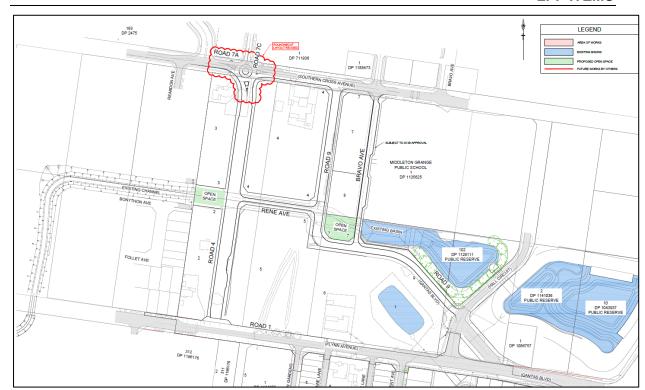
Proposed modification site plan (Source: J. Wyndham Prince)
